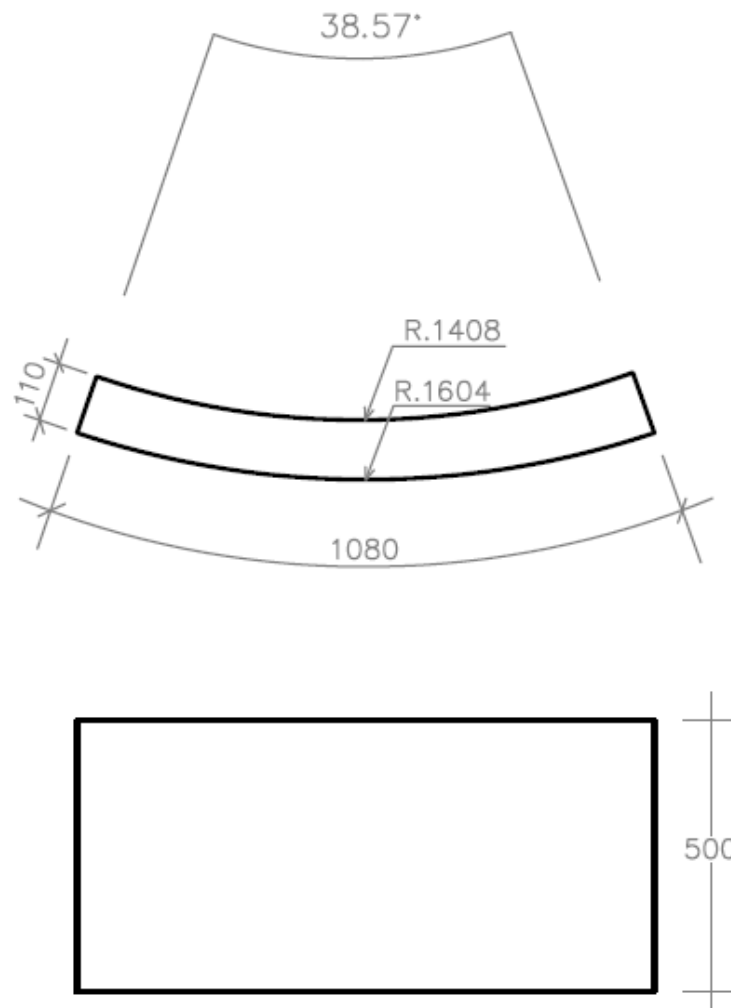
Geometry of small-scale segment (dimensions in mm)
